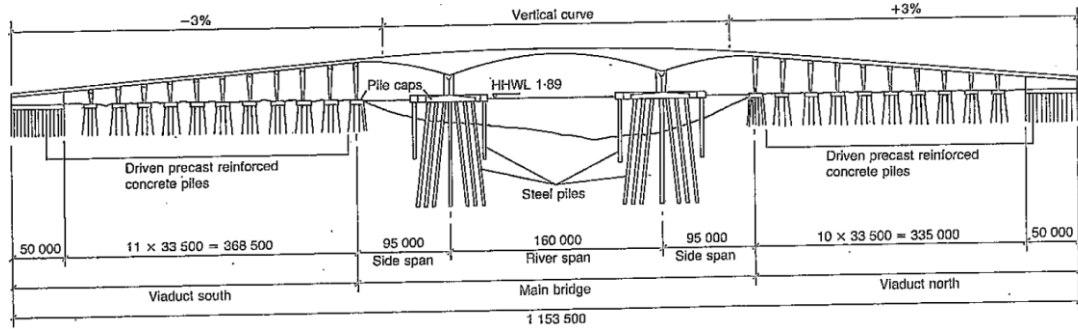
Longitudinal Section of Sultan Yusuf Bridge
